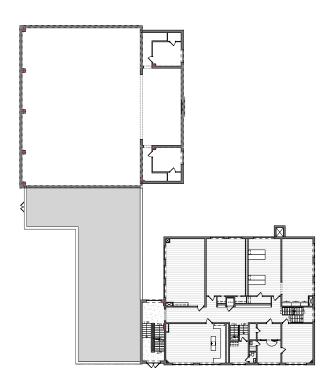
Current second floor plan of Hermann High School. Drawn by Adam Davenport. Graphic scale included.
